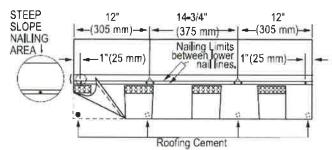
Use six nails and four spots of asphalt roofing cement on steep slopes.
